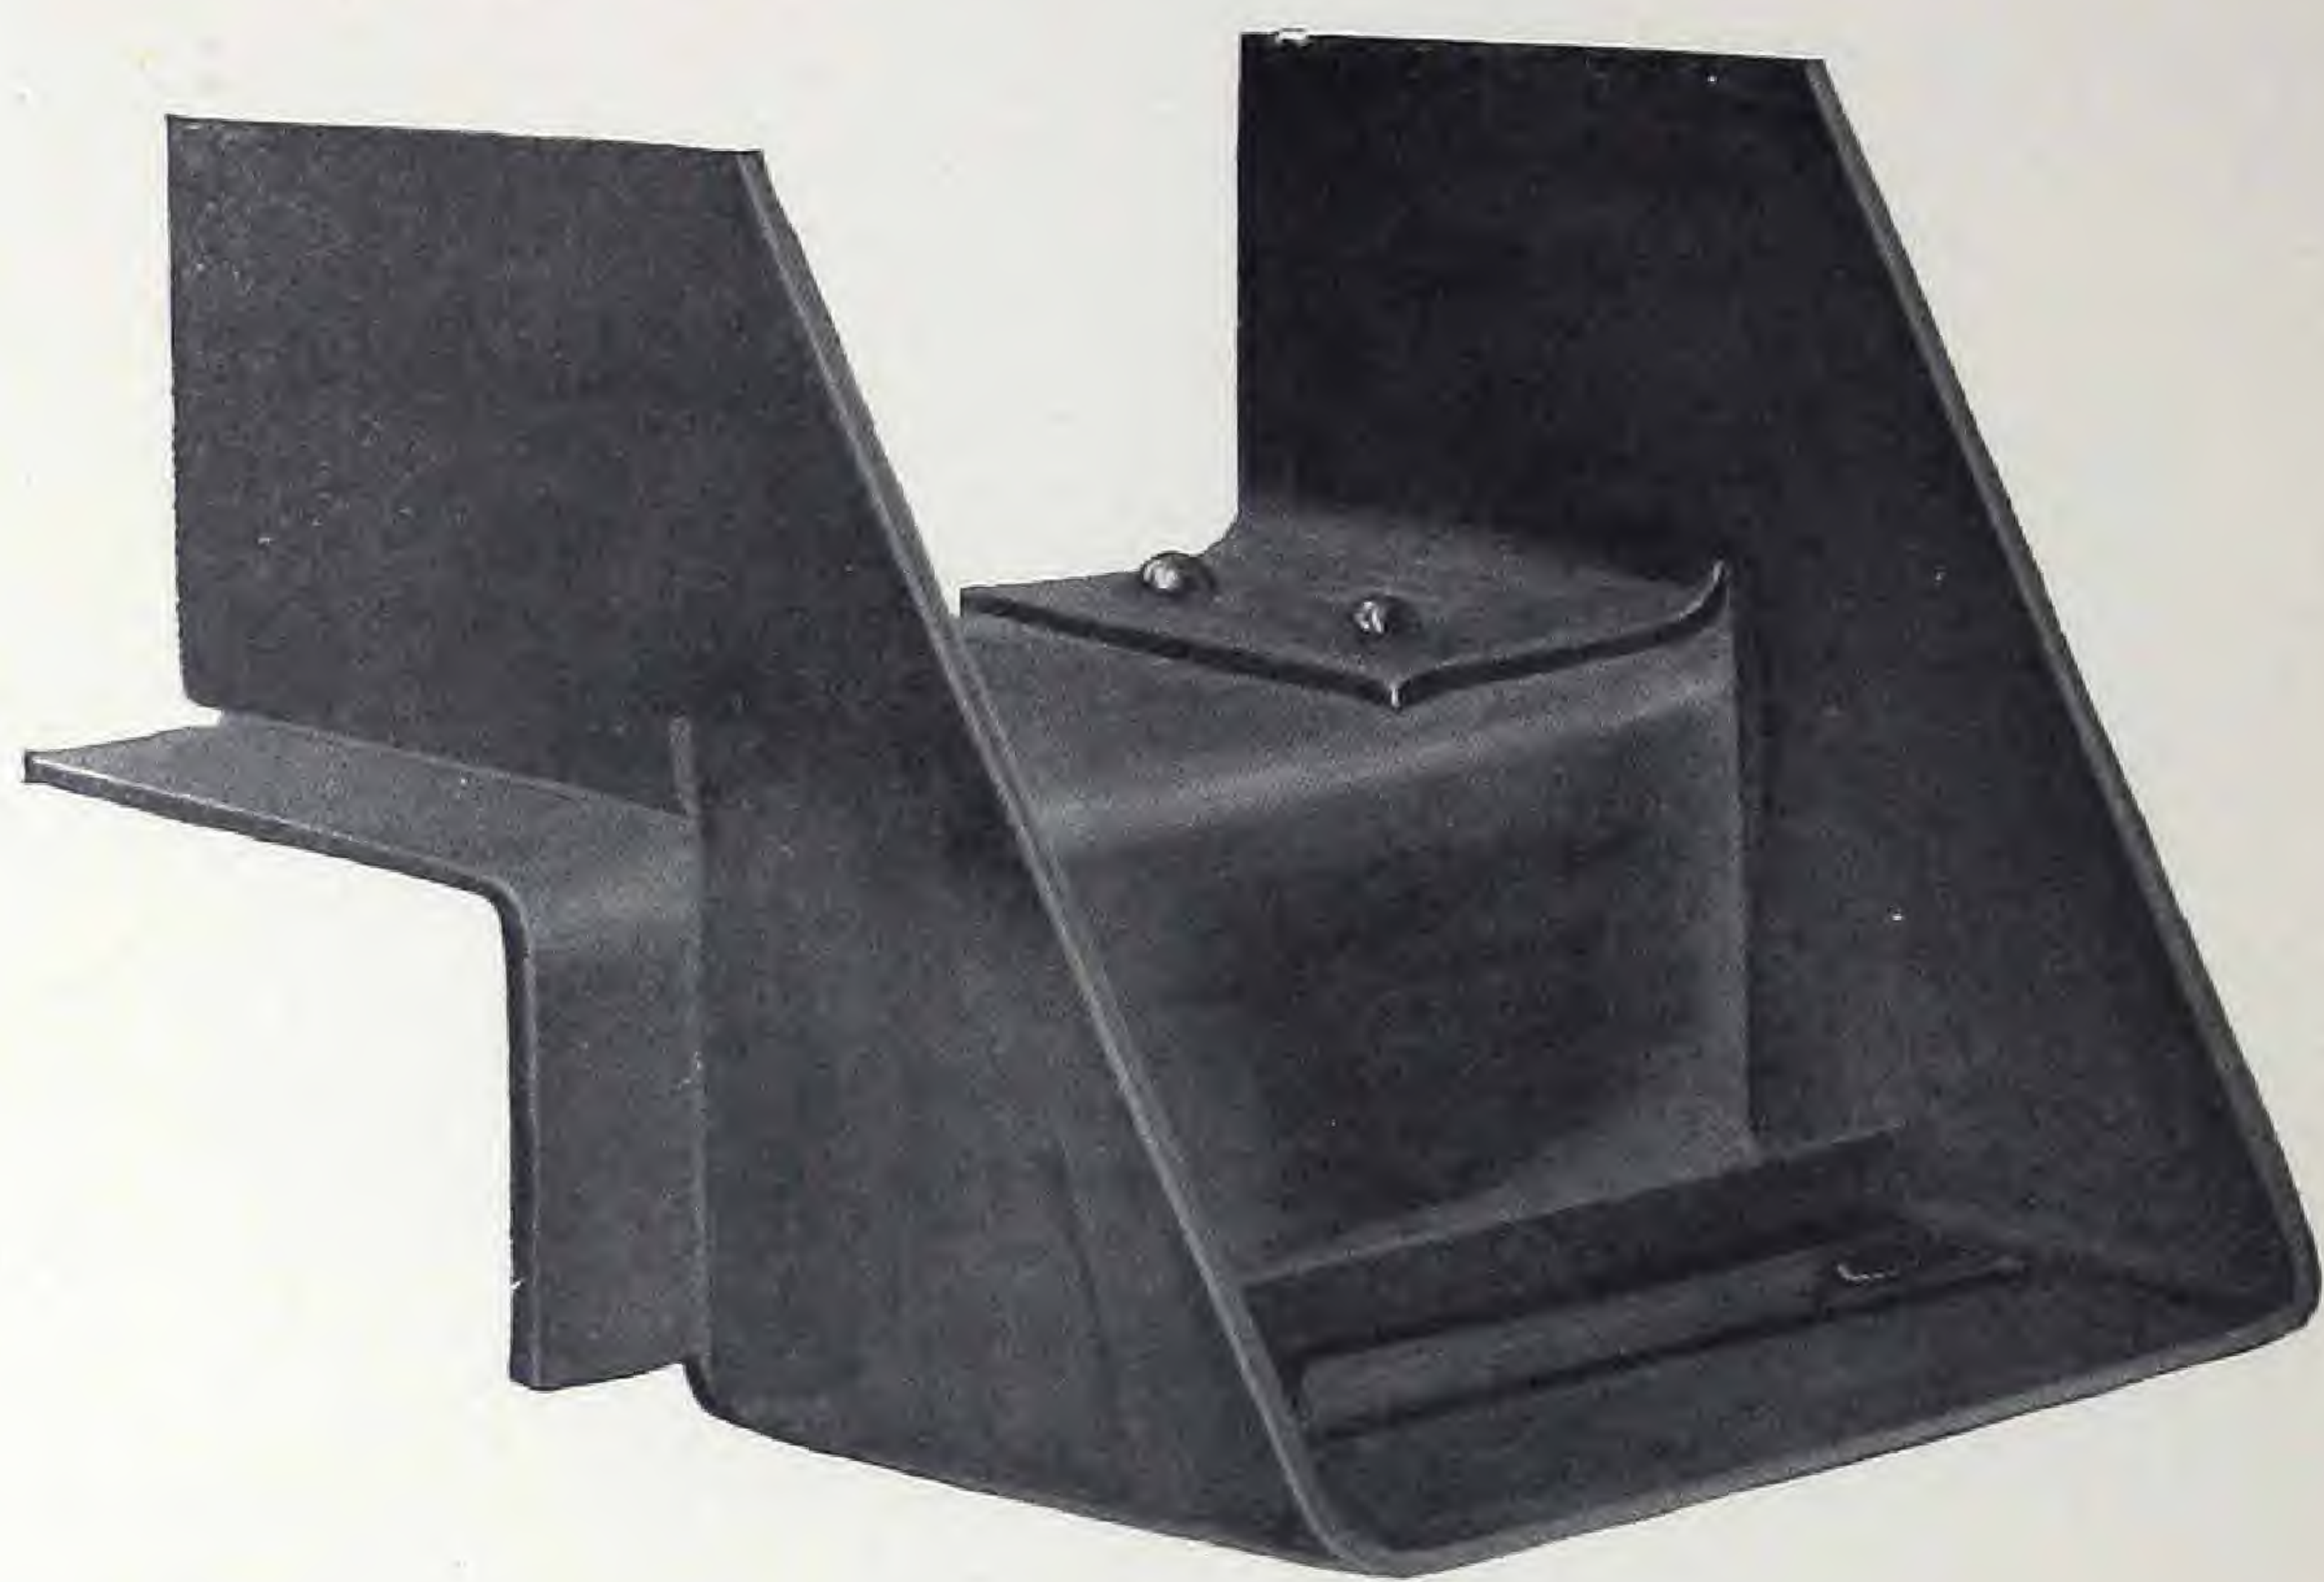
illustrates the use of the Duplex Wall Hanger, by which a better anchor is made and every joist is anchored to hanger in a manner which makes the timber self-releasing in case of fire. Provision is made for attaching anchors to wall hangers.
